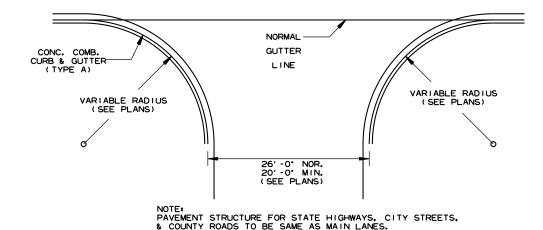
DETAIL FOR COUNTY ROAD TURNOUTS OPEN SHOULDER SECTION
